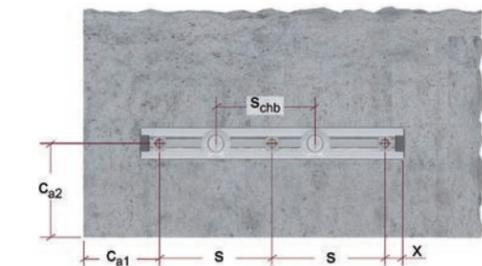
Plan view of an anchor channel system in a concrete member.
